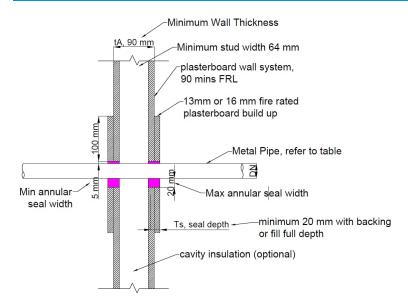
Non-insulated services penetrating -/60/60 and 60/60/60 framed walls - option 2
